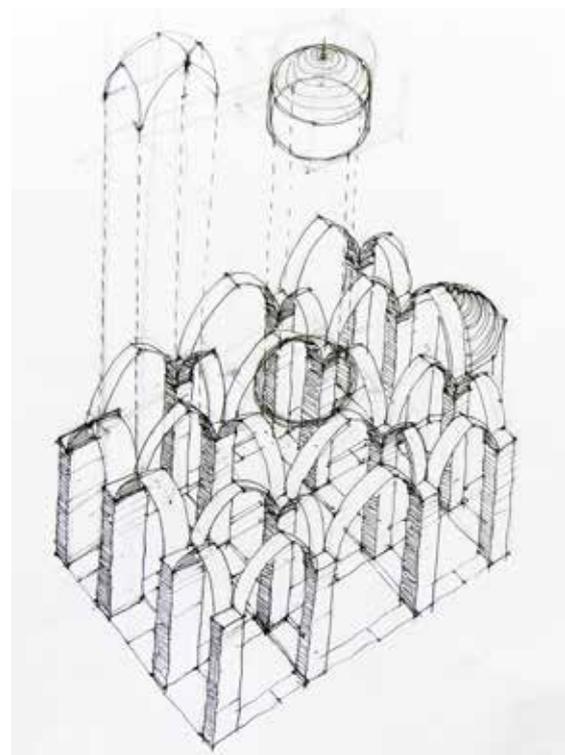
the structure of dome and vaultsof St. Stephen Church. Source: authors.
